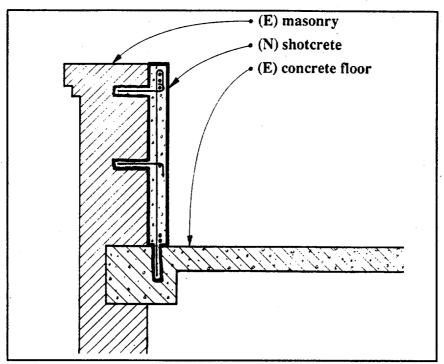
Strengthening a masonry parapet with a new concrete overlay.
